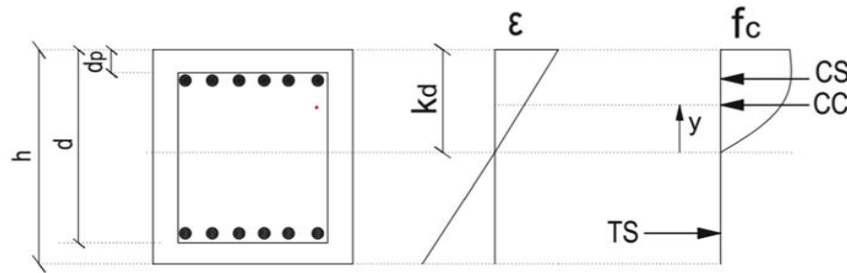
Concrete and Reinforcement Forces for a Section with Compressive and Tensile Reinforcement.
